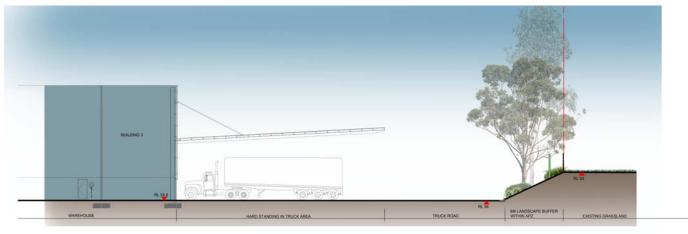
SECTION THROUGH SOUTHERN BOUNDARY (BUILDING 3)
